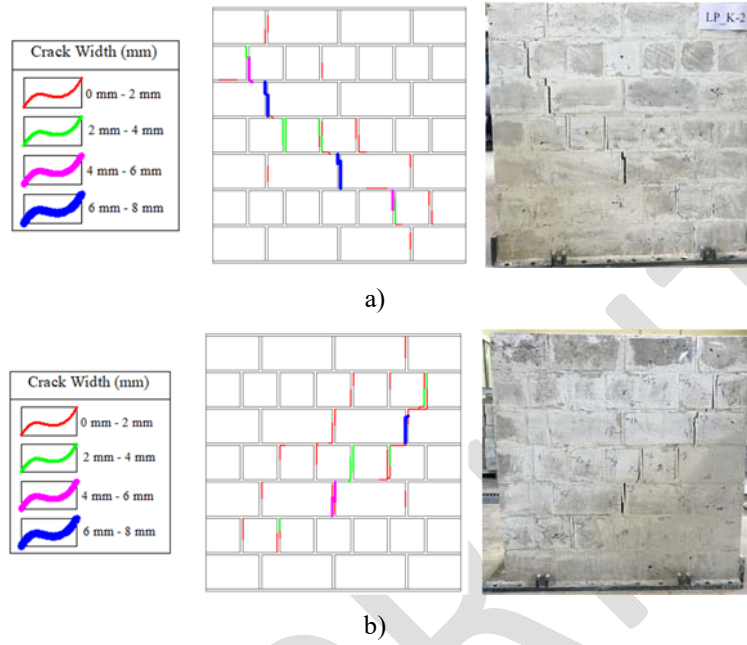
Crack patterns of G2-S wall (a) front view, (b) back view [37]
